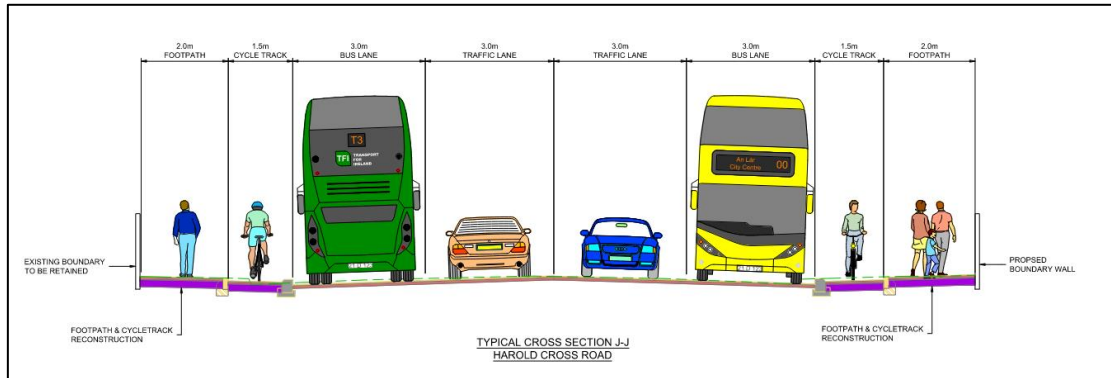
Proposed Cross-Section on Harold's Cross Road
